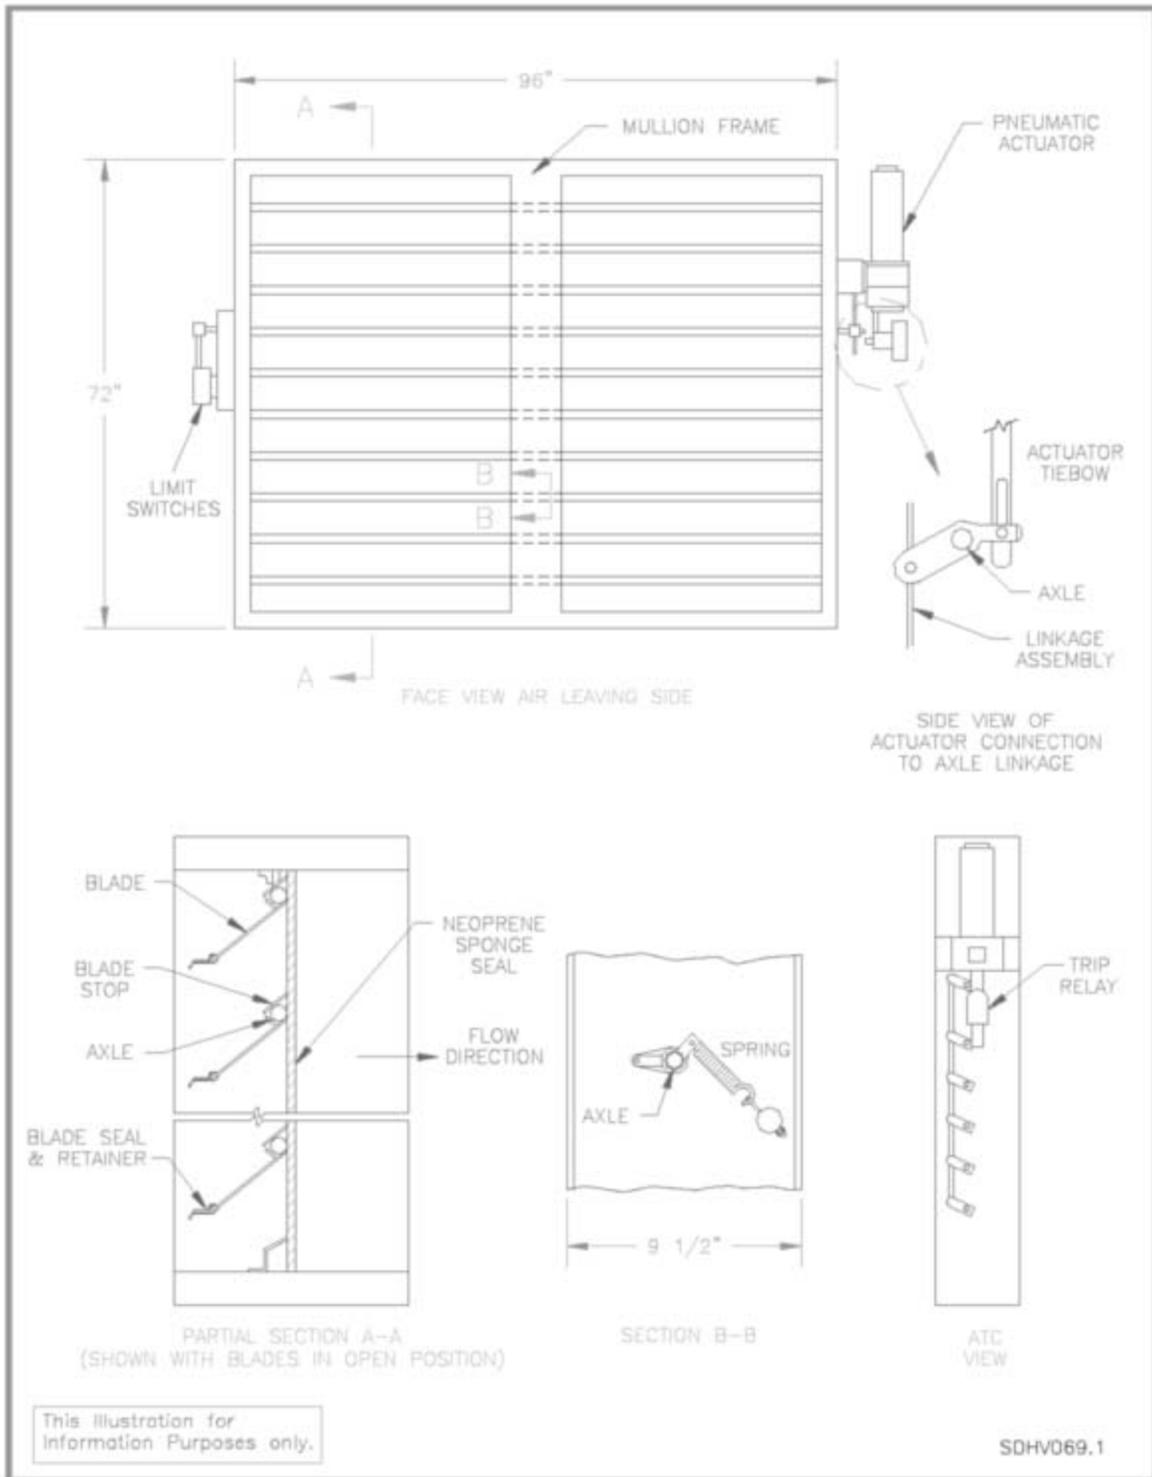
WHB Exhaust Duct Tornado Damper Layout and Detail
